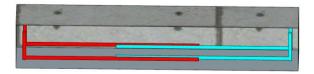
3D Schematic illustration of splice beam specimen for bond tests
